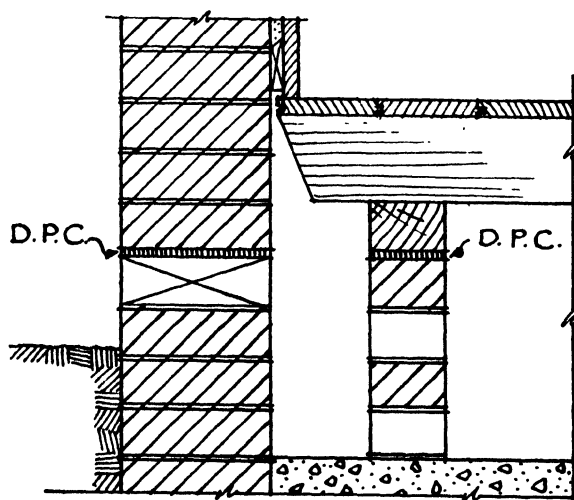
D.P.C. in Solid External Wall—Hollow Floor. (Wood Joists should not be built into Wall.)
